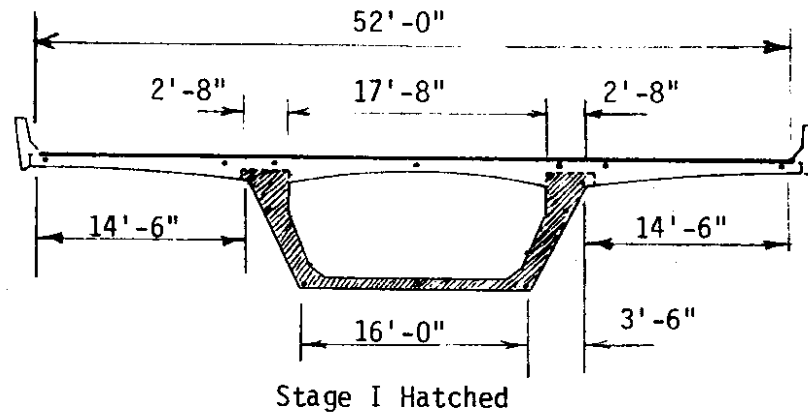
Stage Construction of Cross-Section and Section Dimensions
